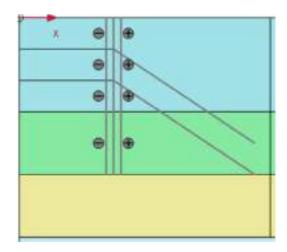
Initial conditions, diaphragm wall and anchors are not active.
